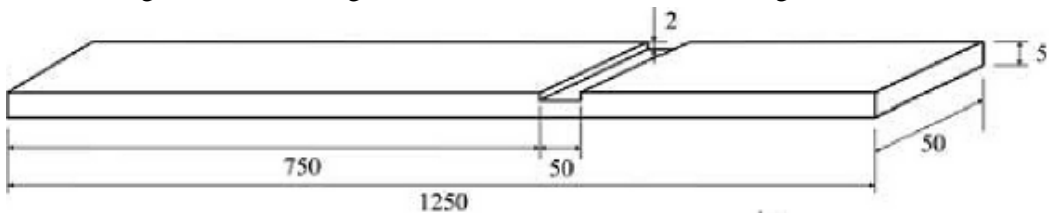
Geometry and dimensions of the test beams containing mill-cut damage
